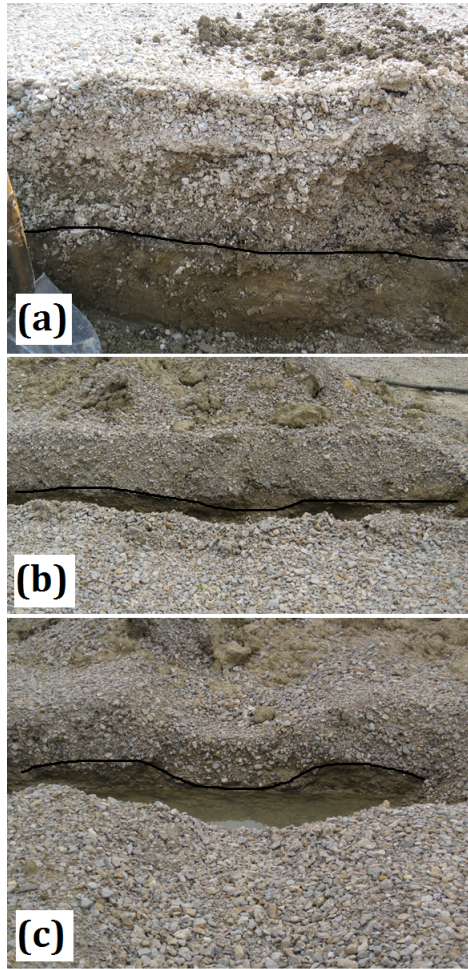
Excavated Trench Photos Showing Surface and Base-Subgrade Interface Deformations in Test Sections (a) 1, (b) 2, and (c) 3 of Cell 5 due to Loading under Flooded Conditions
